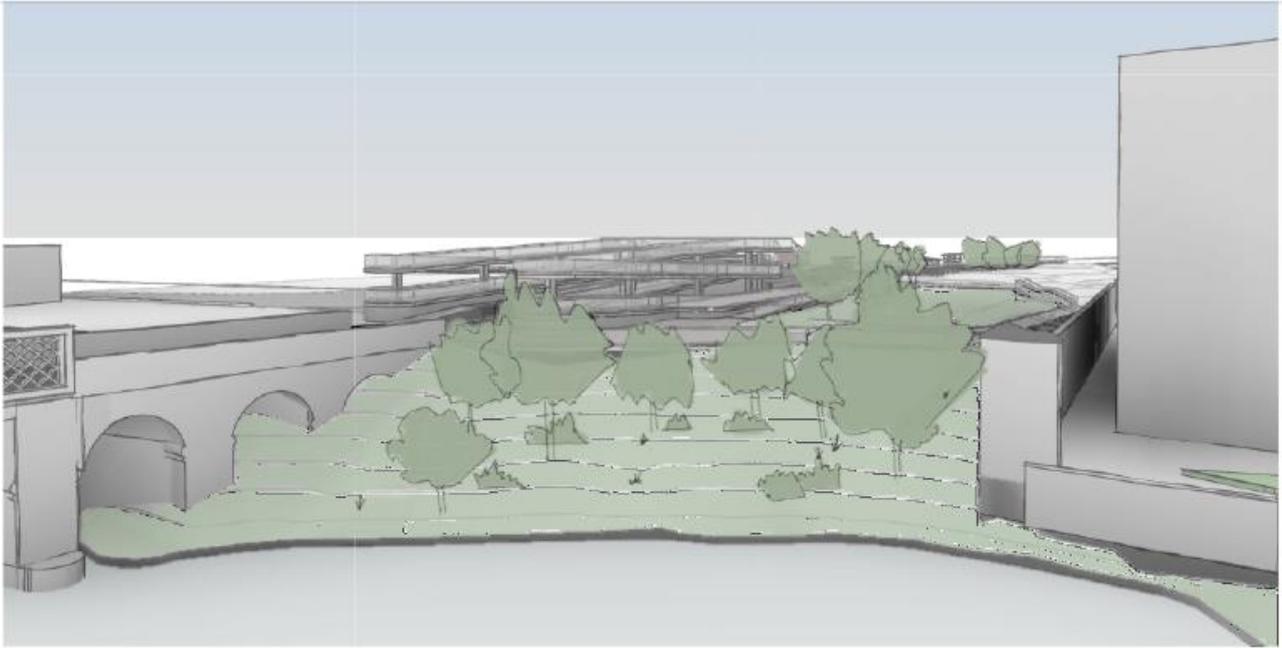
Proposed Heuston West Station, Cross Section Facing North
